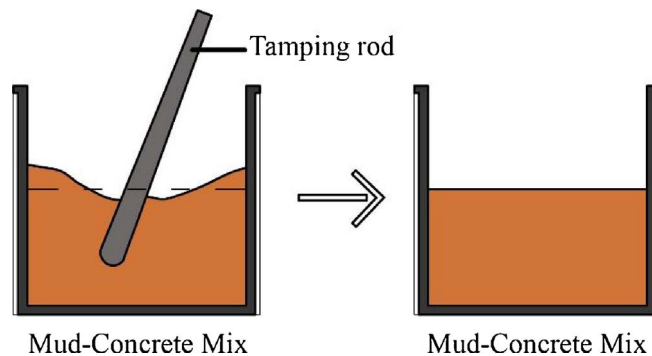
The mixture was poured into 150 × 150 × 150 mm cast iron moulds in two layers and a tamping rod used to remove the air existing in the mixture.
